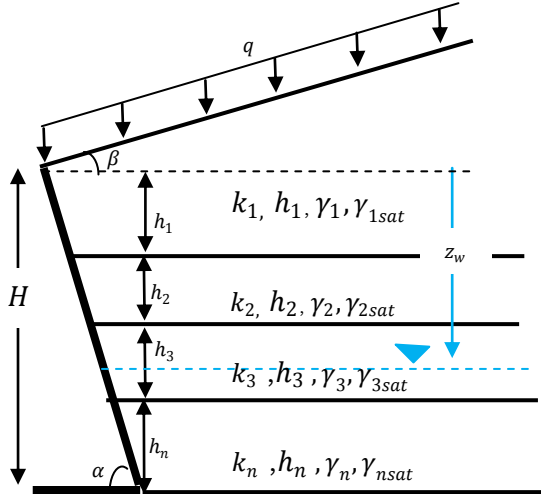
Multi layer soils with a retaining wall of inclined back face and inclined ground.
